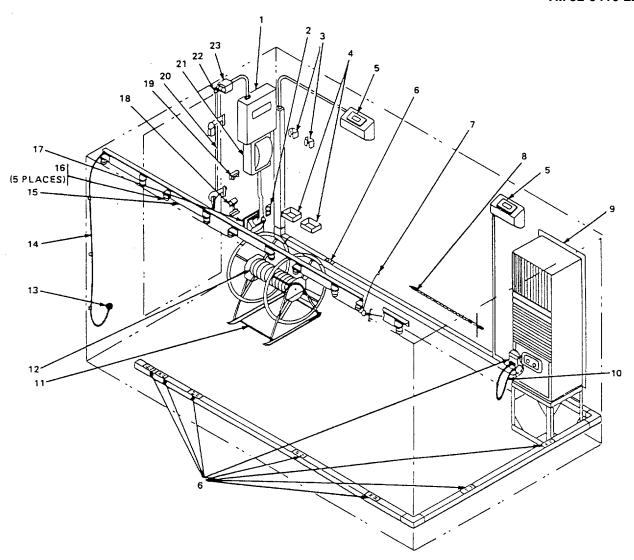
Electrical Equipment Shelter S-281/G - Interior View
